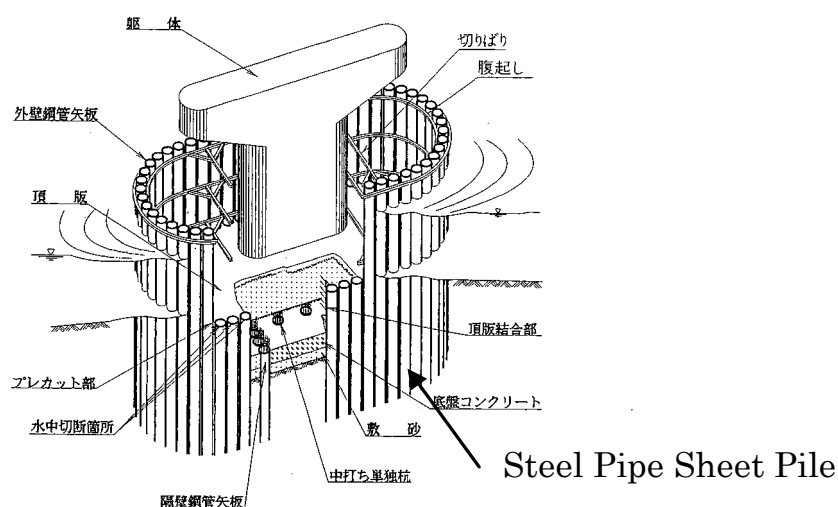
Schematic View of Steel Pipe Well Foundation
